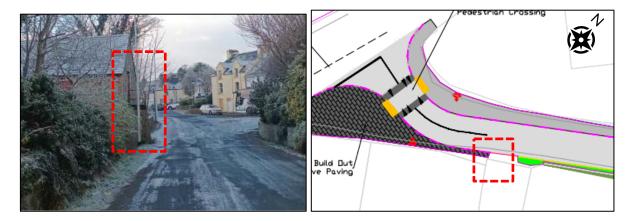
Existing Sign provision and proposed layout drawing (Dwg No. 11493-03-004)
